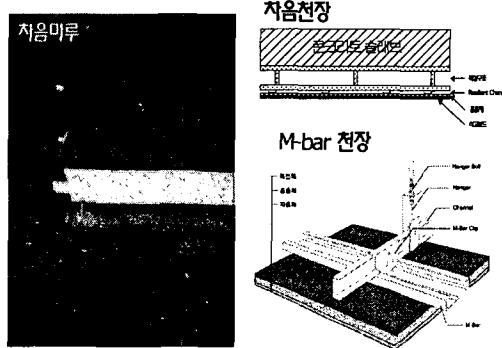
Floor impact noise isolation wooden flooring and ceiling structures
